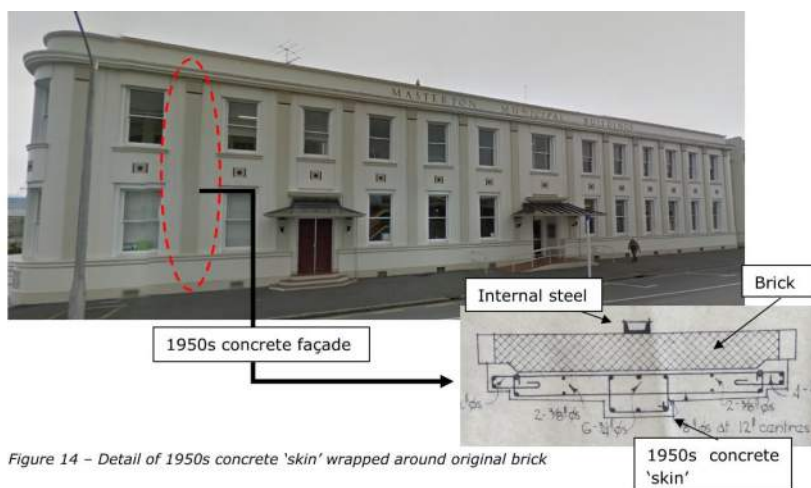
Detail of 1950s concrete 'skin' wrapped around original brick
